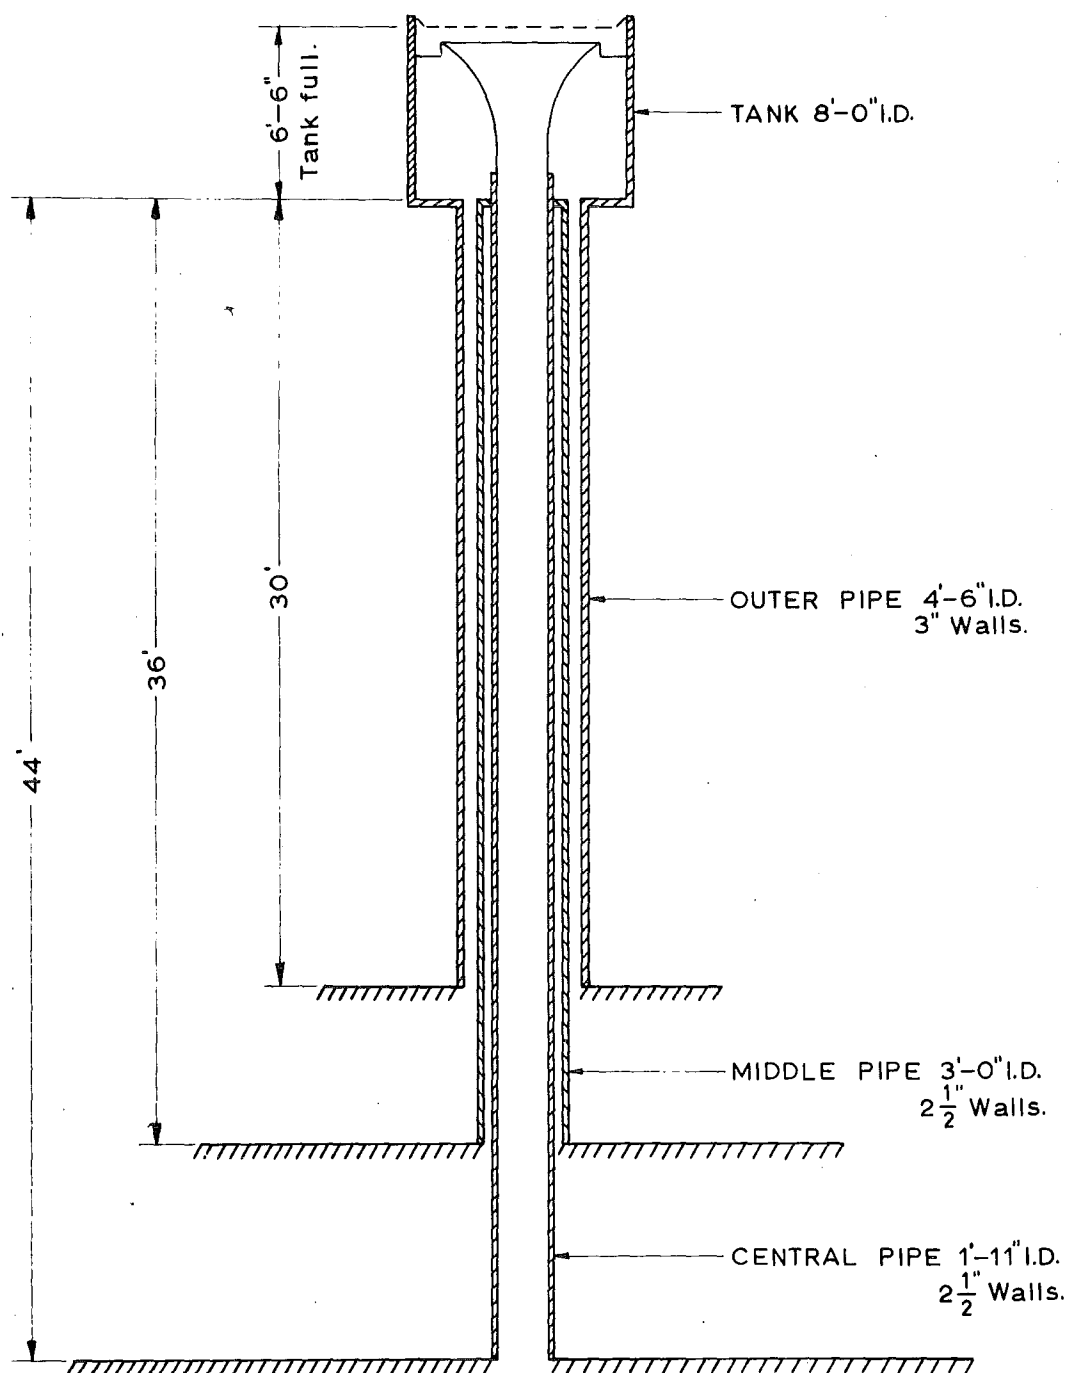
SECTION OF ILAM WATER TOWER
